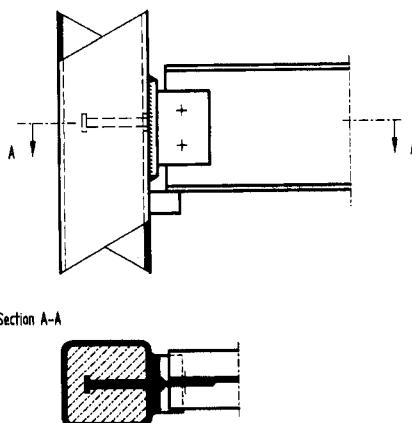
Load transmission into concrete core by inserting a dowel or stud
